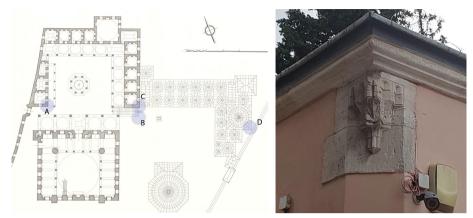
Corner detail of the Zal Mahmut Pasha Complex; a) the location of the corner chamfer in plan (URL 21), b) Detail A (Author's archive, 2019)
